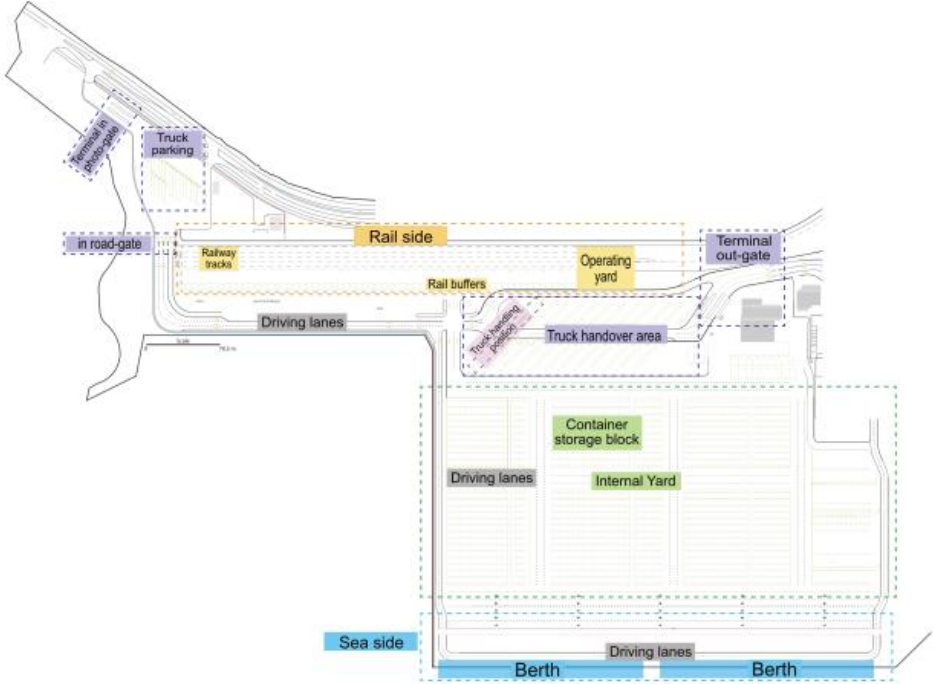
Plan details of the container terminal of Norvik Port (J. D. Rodriguez Millan, 2024)
